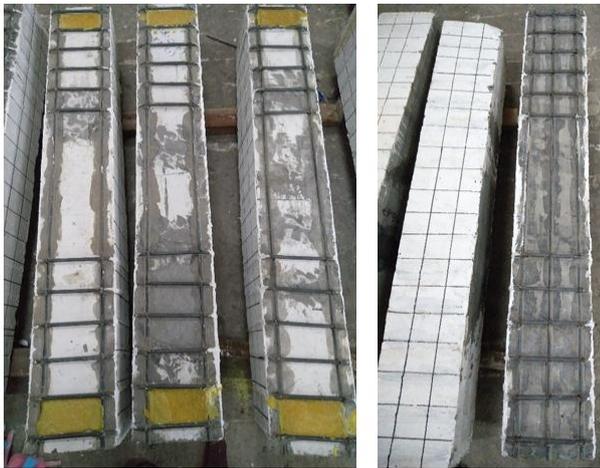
Beams after retrofit with external steel reinforcement method (left 2Ø6, right 3Ø6)
